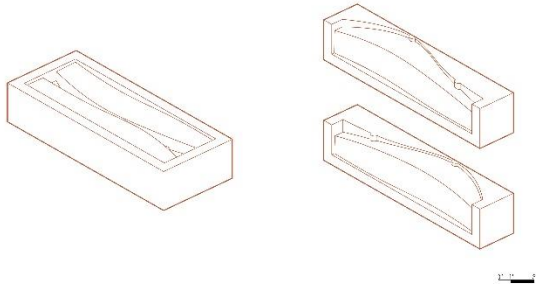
Formwork design developed from the final beam design. Formwork pieces were cut in half for easy removal.
